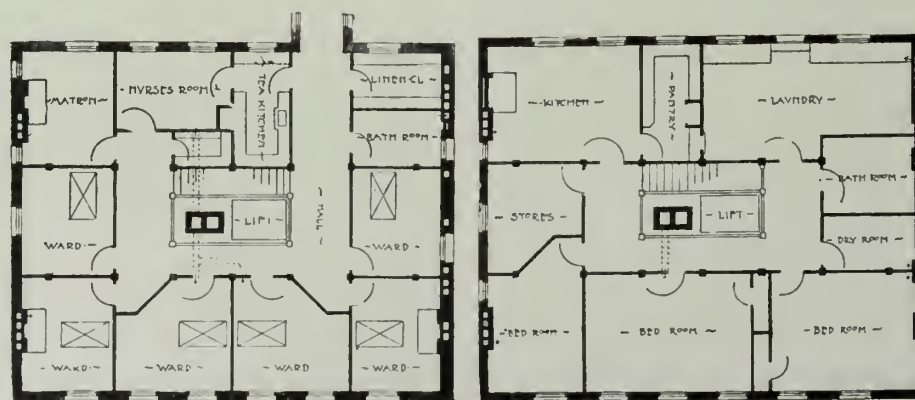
PLAN, FIRST FLOOR, MAIN AND
